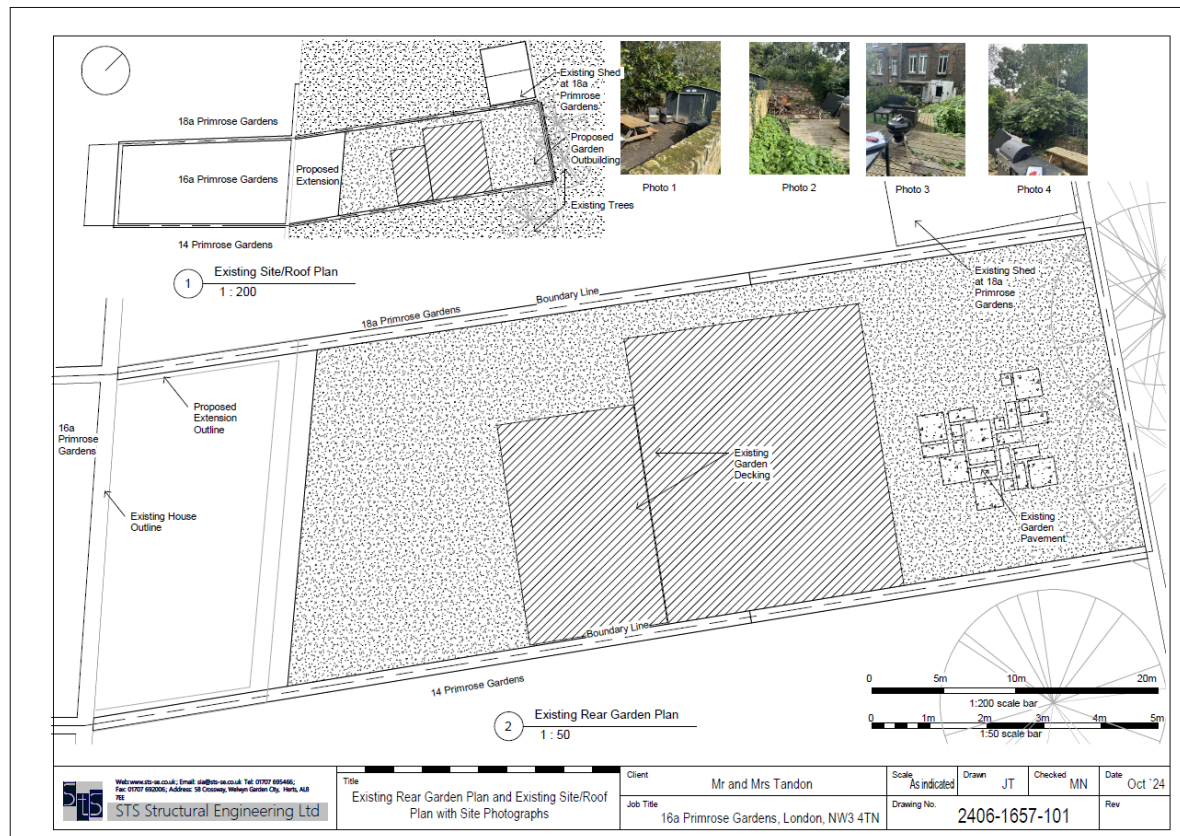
Existing site plan and rear garden plan (Source: submitted drawings)
